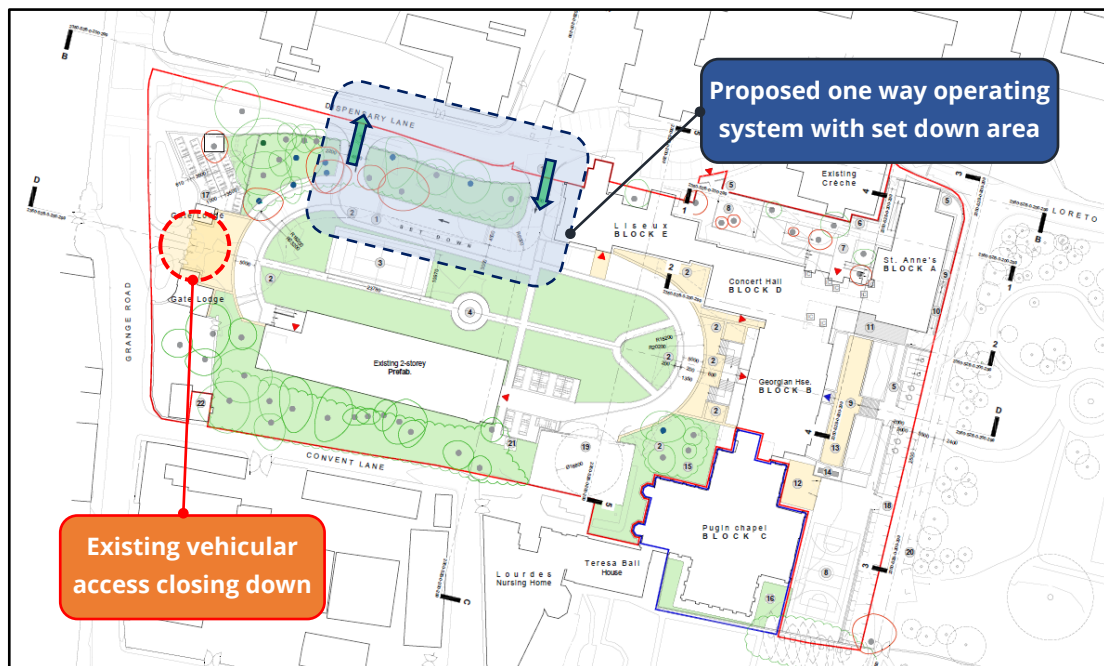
Proposed Site Layout with Proposed Vehicle arrangement
